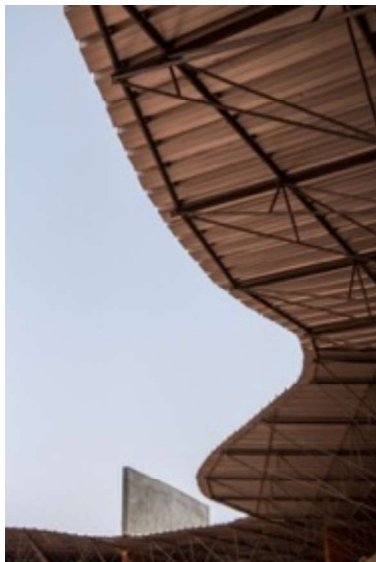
Large roof overhangs provide shading spaces. © Andrea Maretto for Kéré Architecture.
